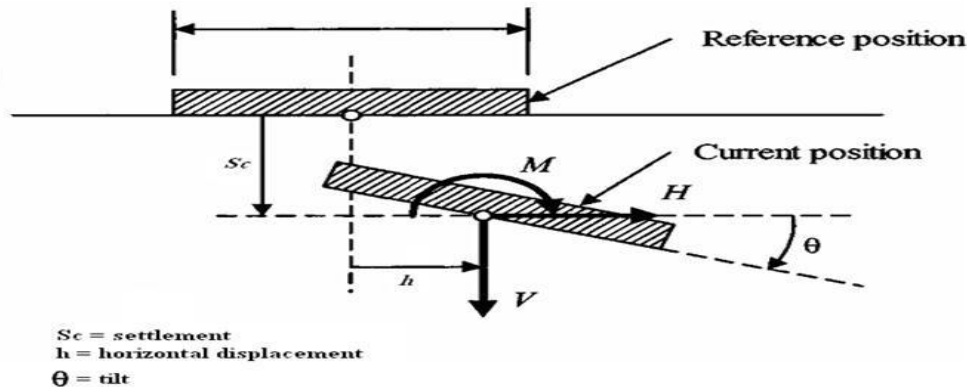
Shallow Foundation Subjecte to eccentric-inclined load
